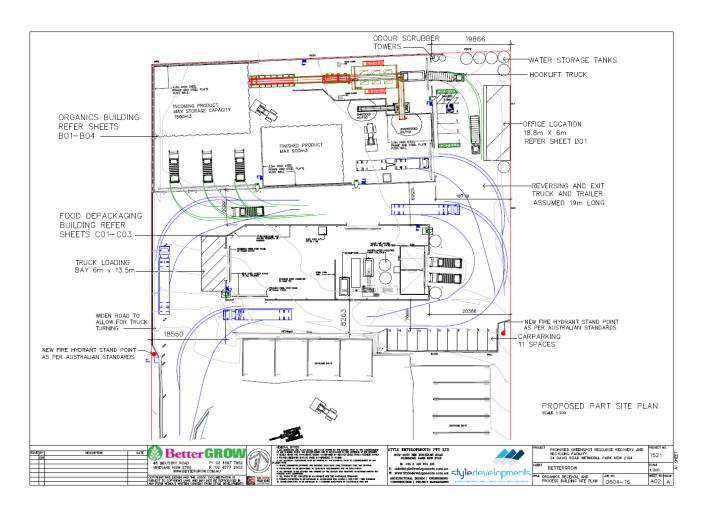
Site Layout - Kerbside Organics Processing and Food Depackaging Buildings
